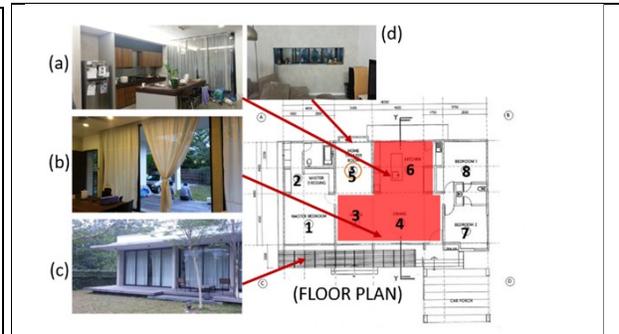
Skudai Box house with significant spaces layout and the photos. Point 3 and 4 as the Dining attach Living Hall, Point 6 as the Kitchen
